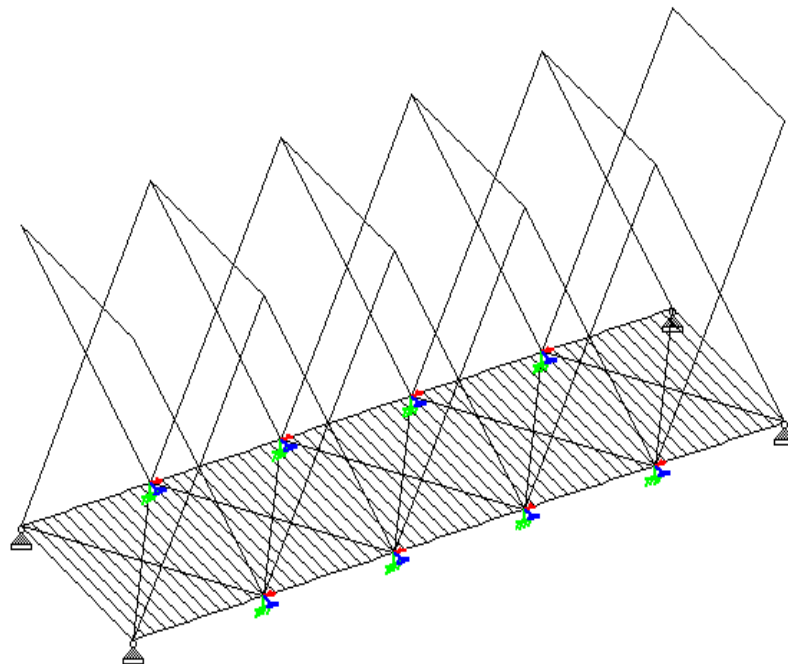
Plan view of Pedestrian bridge made up of Bamboo with cross stiffener -Case 5 (BC5)
